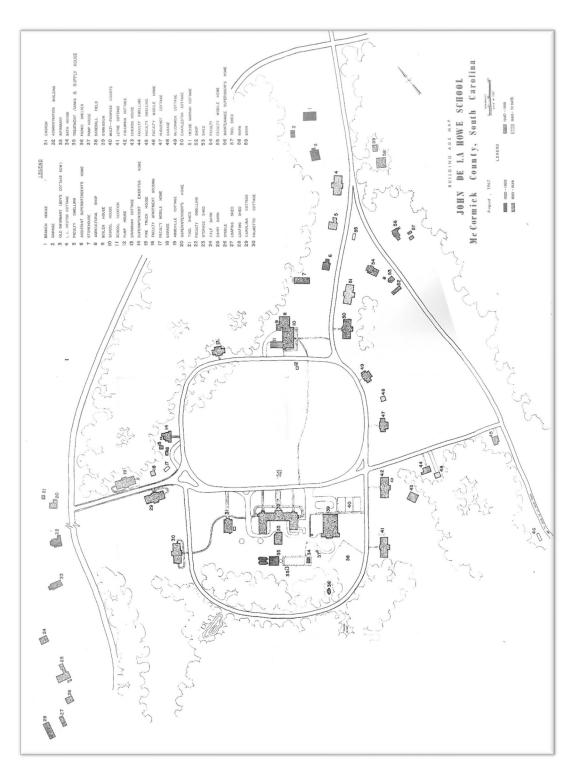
Jones and Fellers Building Age Map of JDLH School which establishes the earliest building dating attempts. Completed in 1967, Hester and Hessie Marrah Cottages were under construction and work on Nickles Cottage had not begun yet, not appearing on the map. Source: Comprehensive Campus Plan: John De La Howe School, by Jones and Fellers Architects, Engineers, and Planners, Copyright 1967.
